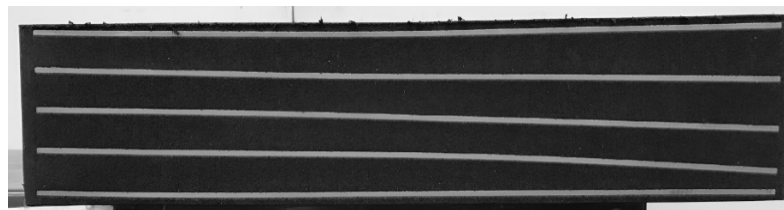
Photograph of cut elastomeric bridge bearing with manufacturing defects
